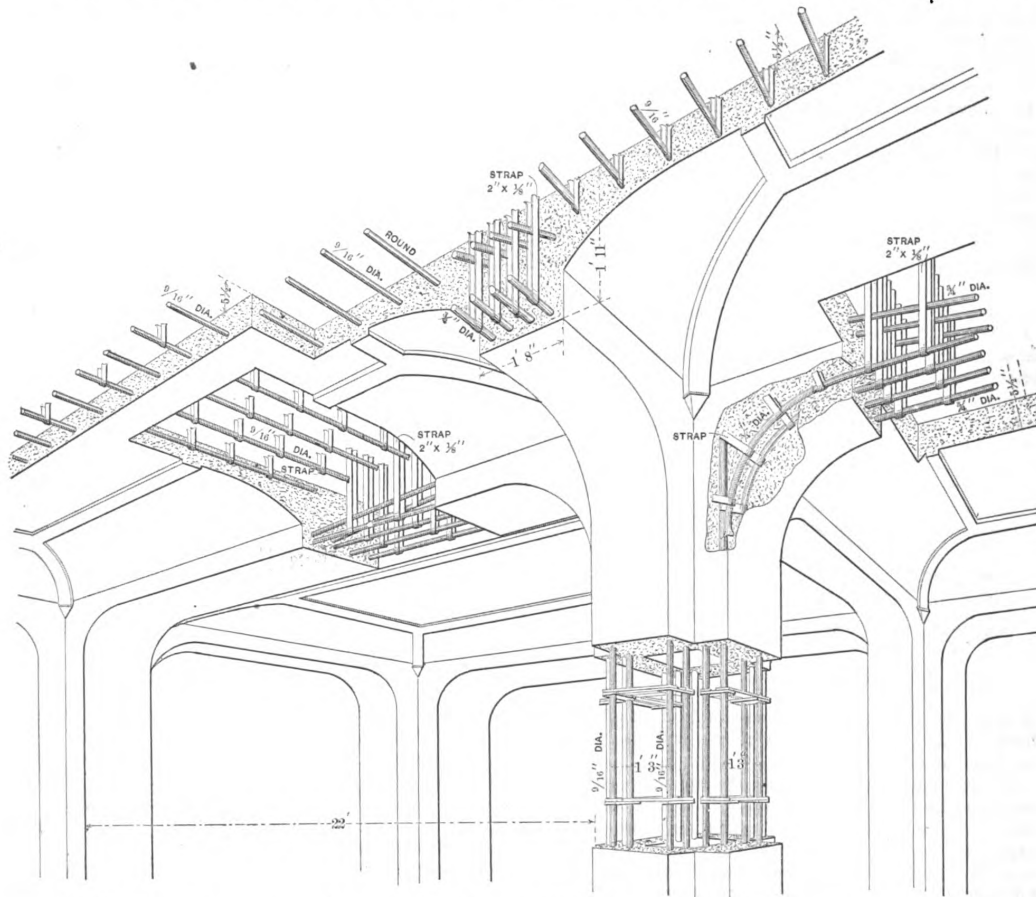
View Showing Construction of Floors, Pillars and Arches in the New Building of the Society of Civil Engineers of France.
